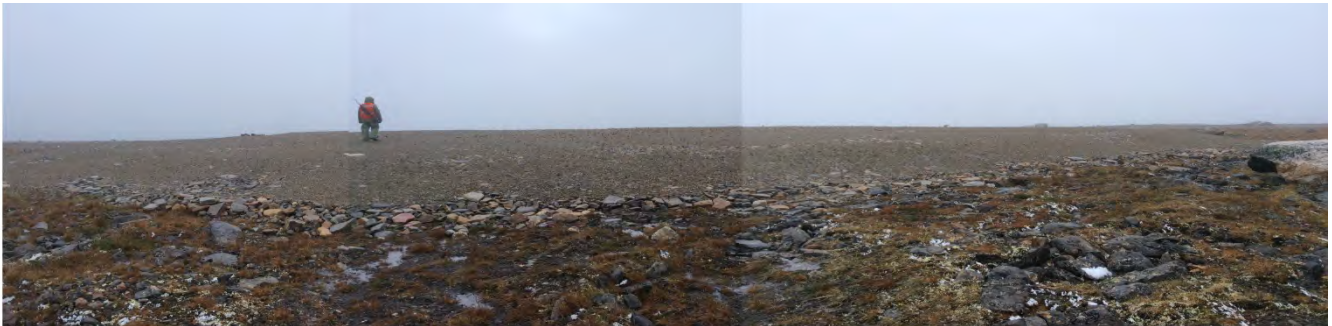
Station West Landfill, Lobe E2 – South slope facing north (ATT202\_Photo1.jpg) (ATT203\_Photo2.jpg) (ATT204\_Photo3.jpg)
